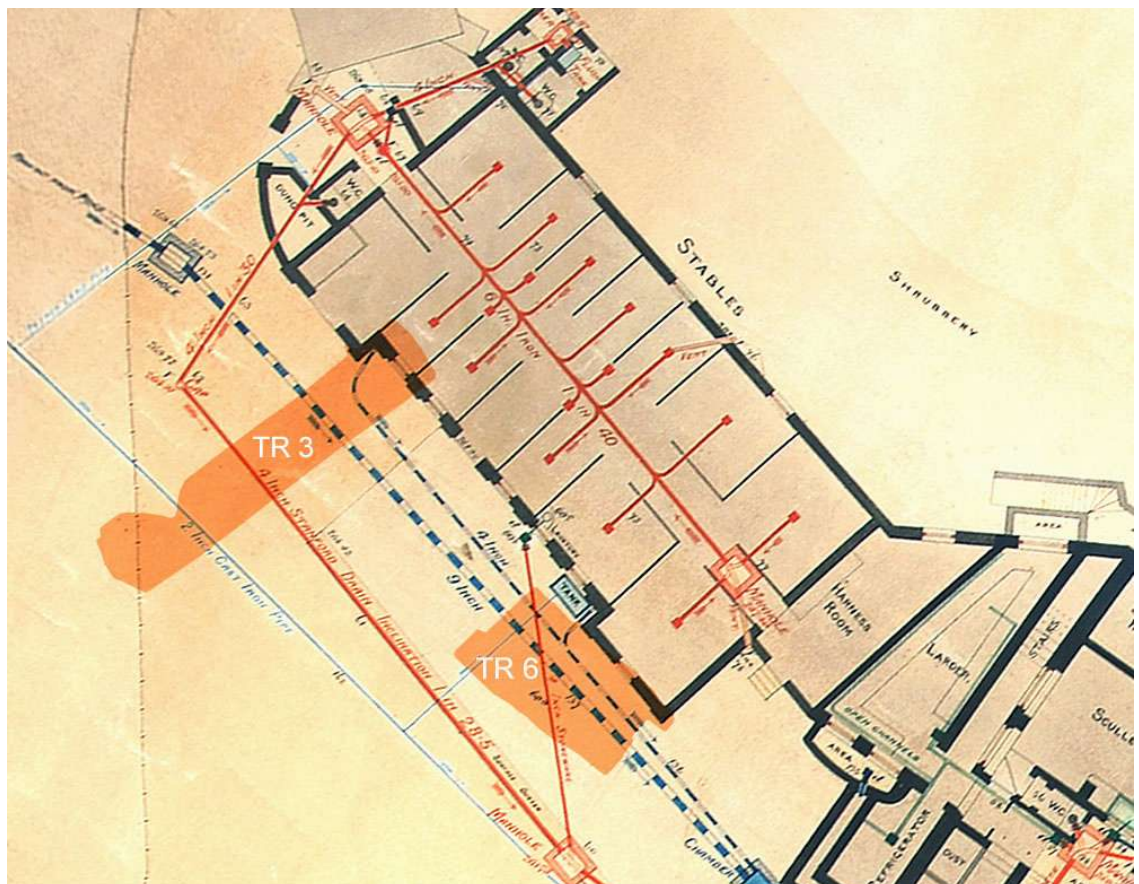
Detail from the 1886-94 ground floor and drainage plan of Breakspears (Fig. 8), reorientated to north and with the location of Trenches 3 and 6 superimposed
